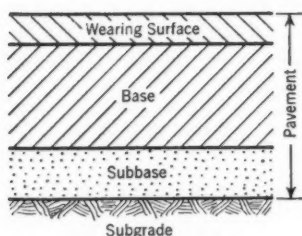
STRUCTURAL ELEMENTS OF A PAVEMENT
